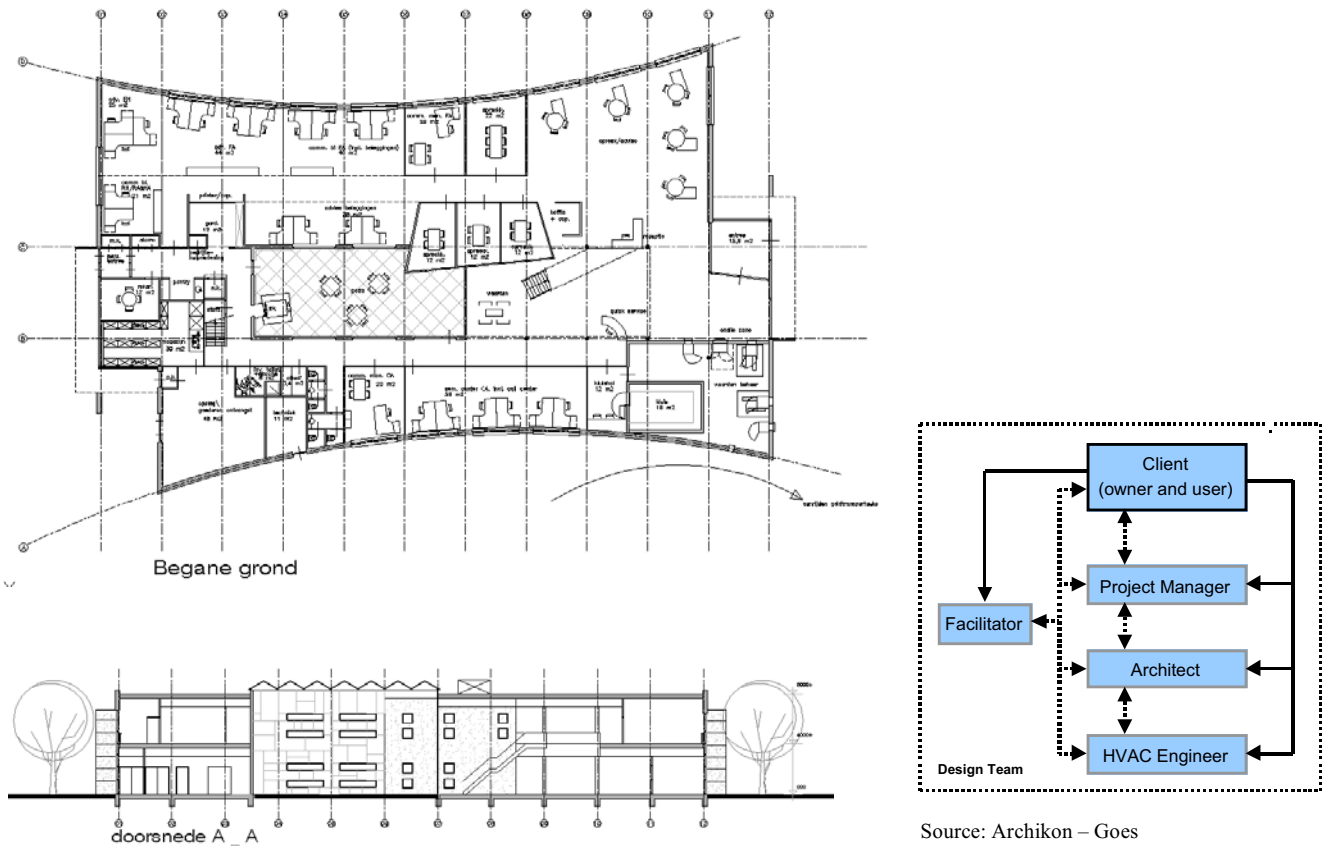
Groundfloor Plan and Cross Section, Design Team.
